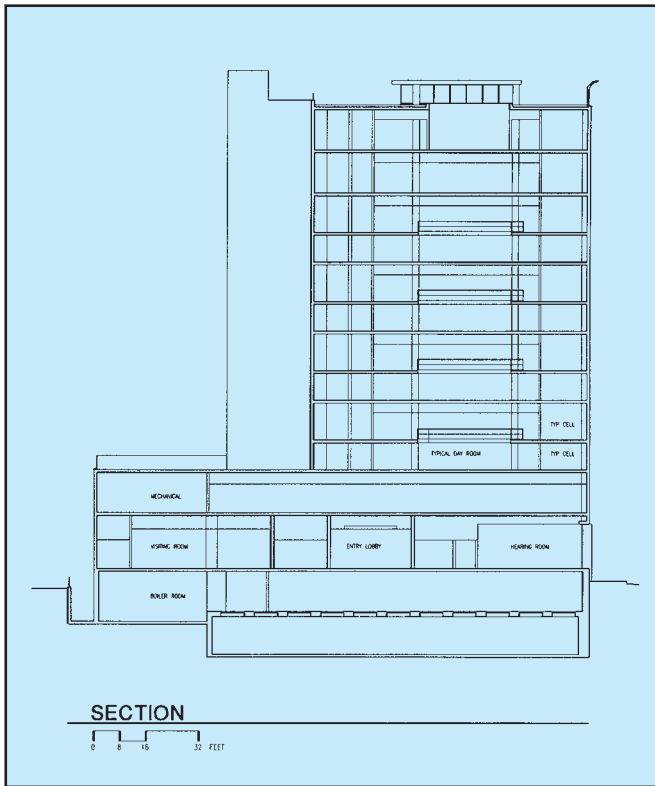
Section plan shows below-grade floor, two service levels and upper inmate floors.
